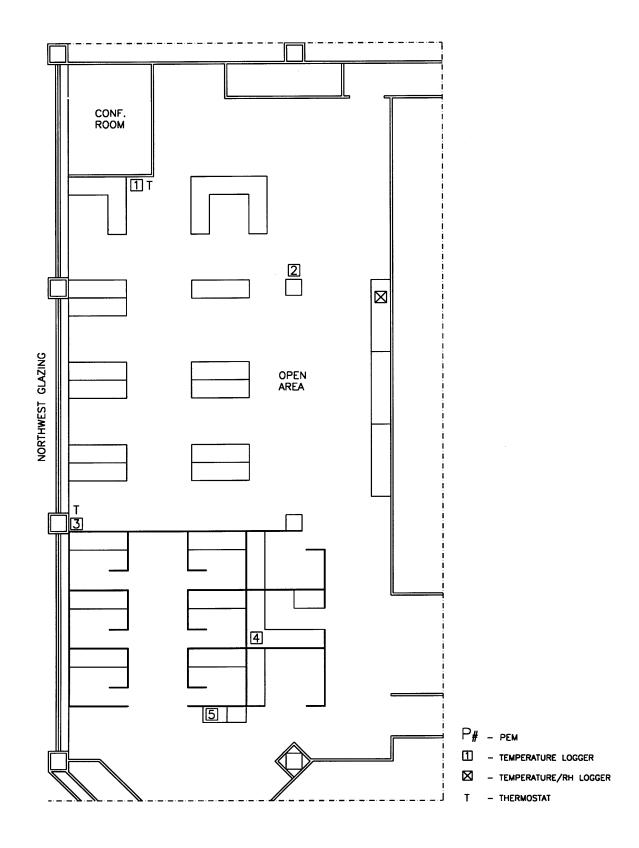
Floor Plan, Control Group, 17th Floor of 1455 Market St.
